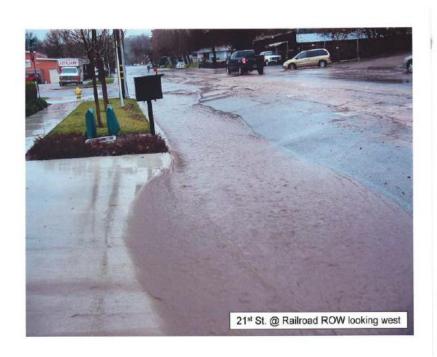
21st St. @ Railroad ROW looking west - Before
